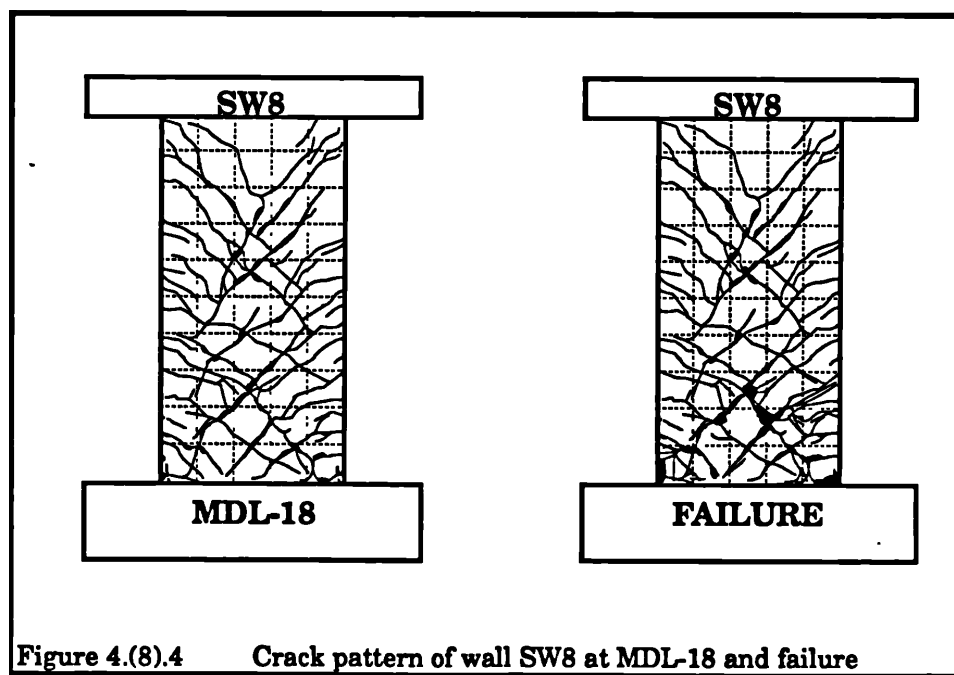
PilaSW8: DS2a - cracks at MDL-18 (spalling) and Failure
